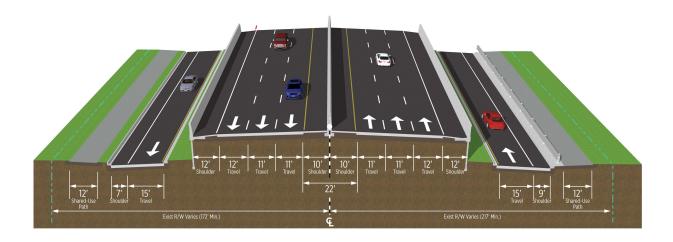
Segment 1 - Typical Section 3 from East of San Fernando Dr to West end of Gandy Bridges over Old Tampa Bay
